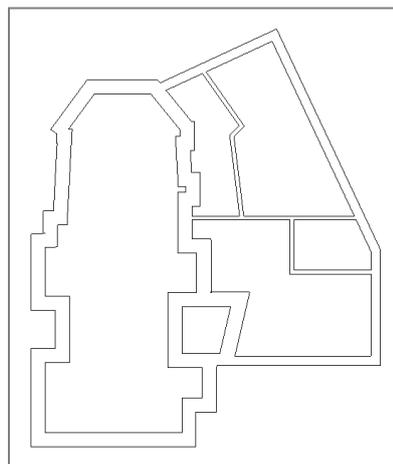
The floor plan of the ground floor as designed in Revit® after the extrusion of the walls.
